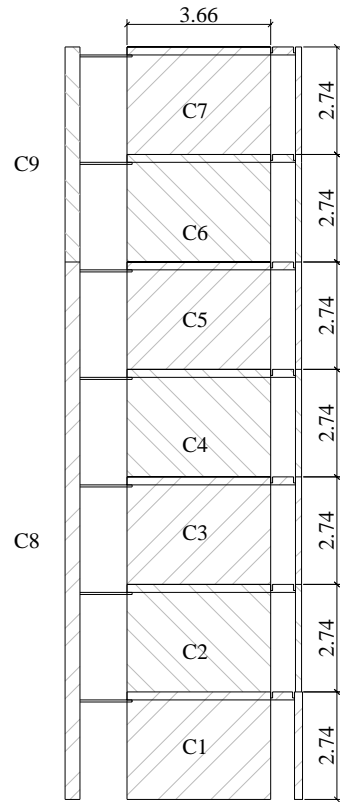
Elevation dimensions (unit: m) of the shear wall building slice
